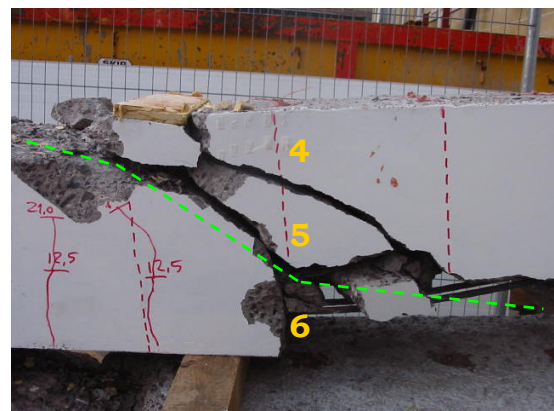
Right span of SLB P4d-2S8@d at failure
